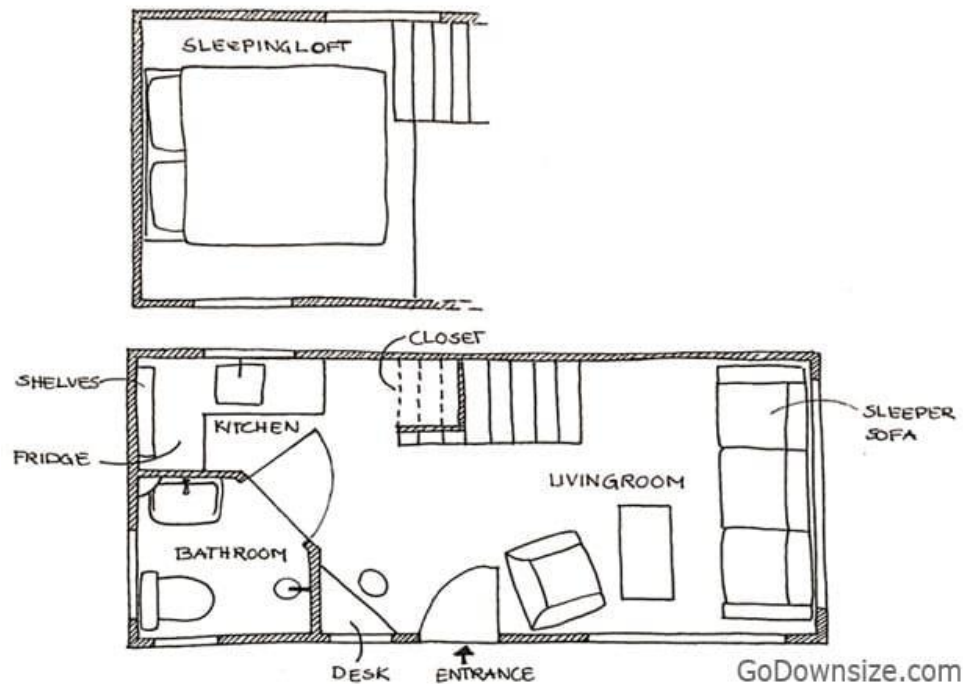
Example of floor plans of a tiny house (Source: Storgaard, 2020)
